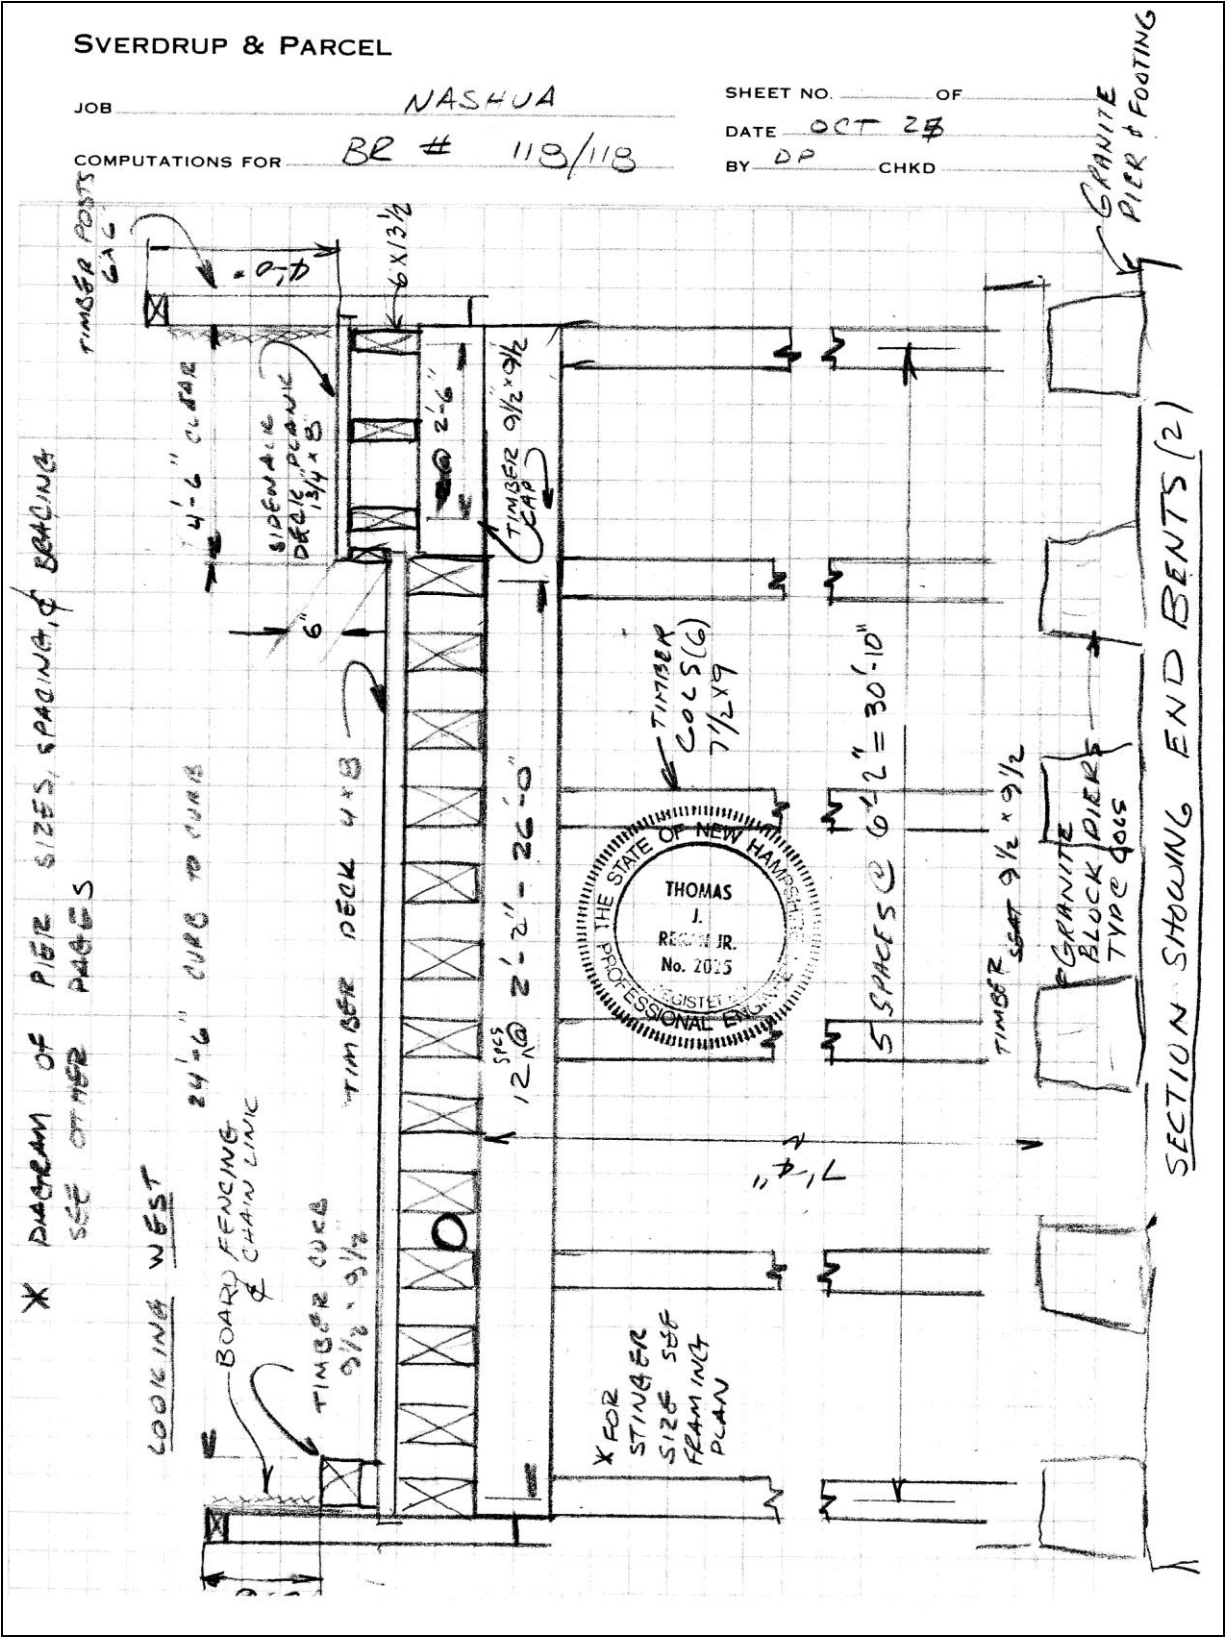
Fairmount St. Bridge Engineering Inspection Sketch by Thomas Regan, Jr. CE, Sverdrup & Parcel Engineers, October 1979 (NHDOT Bridge Inspection File).
